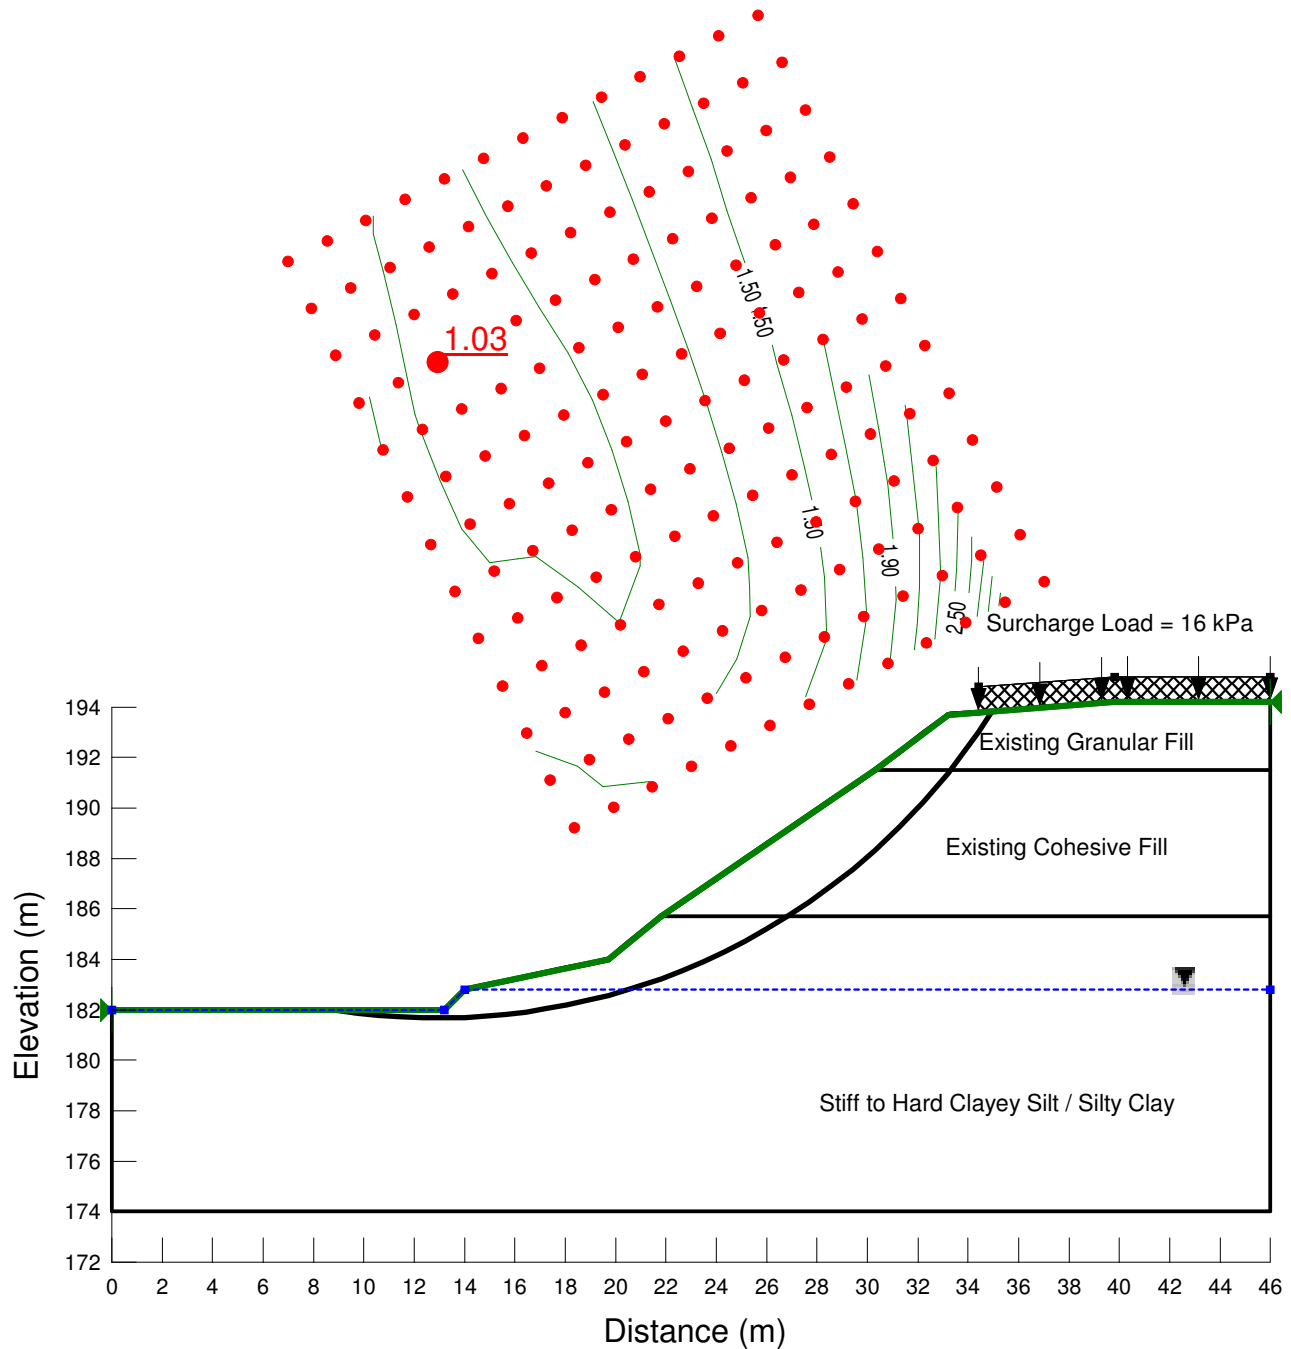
Slope Stability Analysis of Existing Embankment beside Culvert - Sta. 15+205
